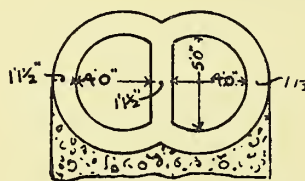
THE DIAGRAM SHOWS A SECTION OF THE HIGH LEVEL CULVERTS. THESE ARE BUILT OF BRICK AND BEDDED IN CONCRETE.
